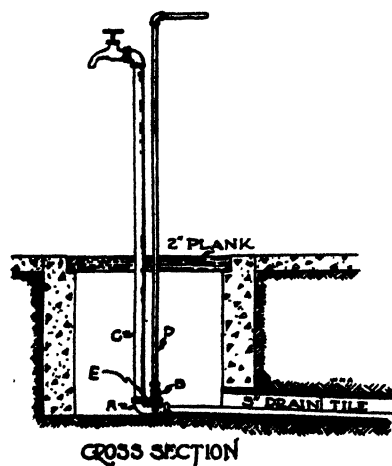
Running water in the poultry house. The non-freezing hydrant used to drain pipes to prevent freezing. A, Stop-and-waste valve; B, Fitting for extension handle; C, Riser pipe; D, Extension handle; E, Drain hole valve.
